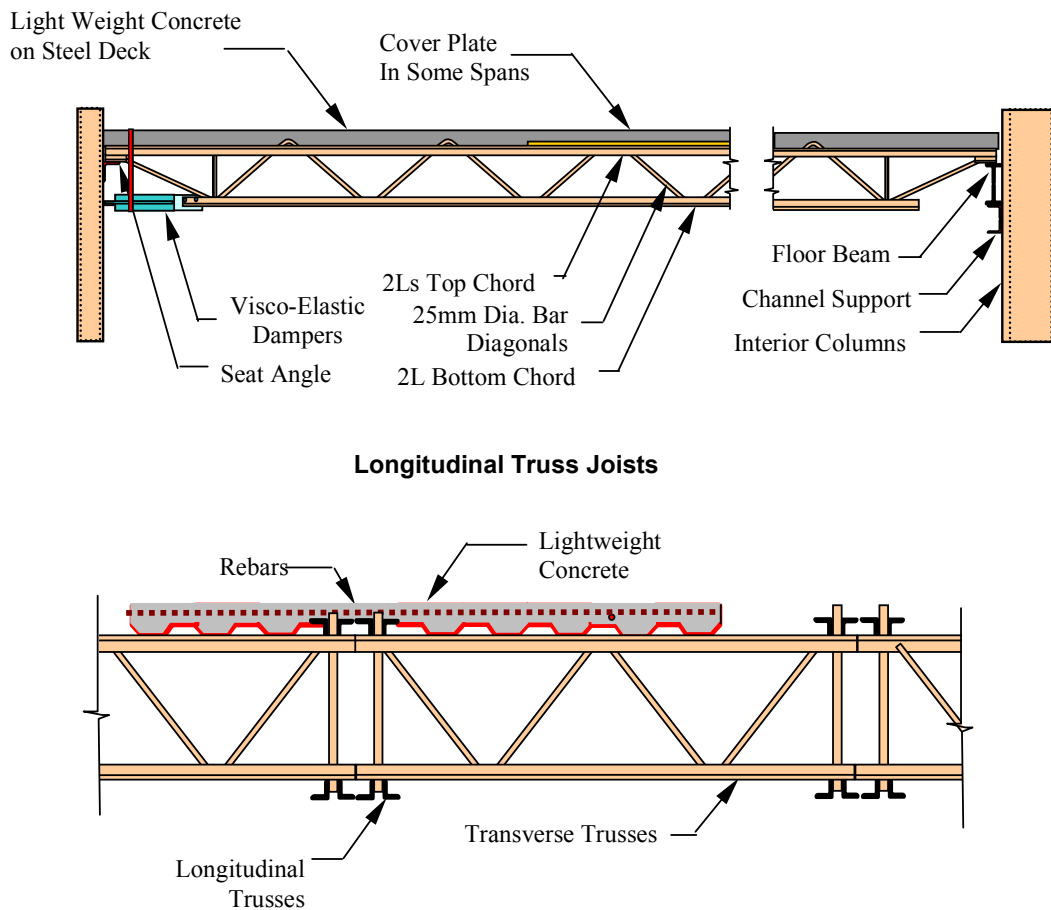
Longitudinal Truss Joists (top) and Transverse Truss Joists (bottom)
